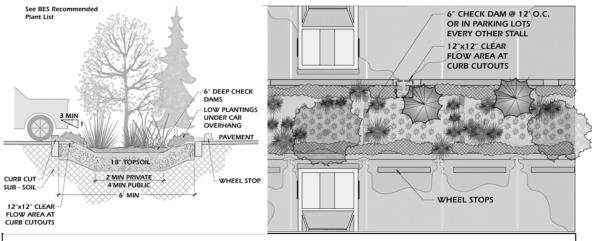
Typical section and plan of Vegetated Swale
